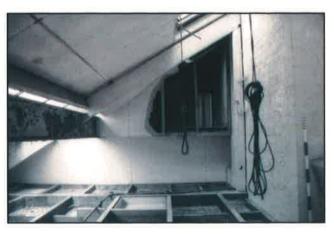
1/5 looking south, showing exposed floor beams and skylights
